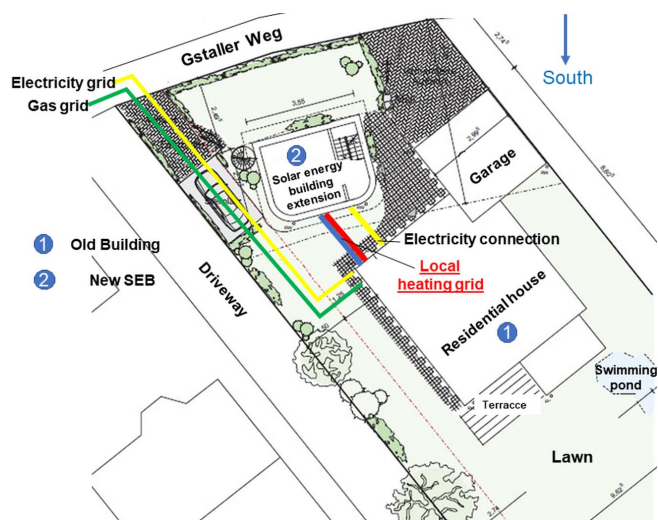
Overview of the existing building No. ① and the new solar- house No. ②, connected by a local heating grid.
